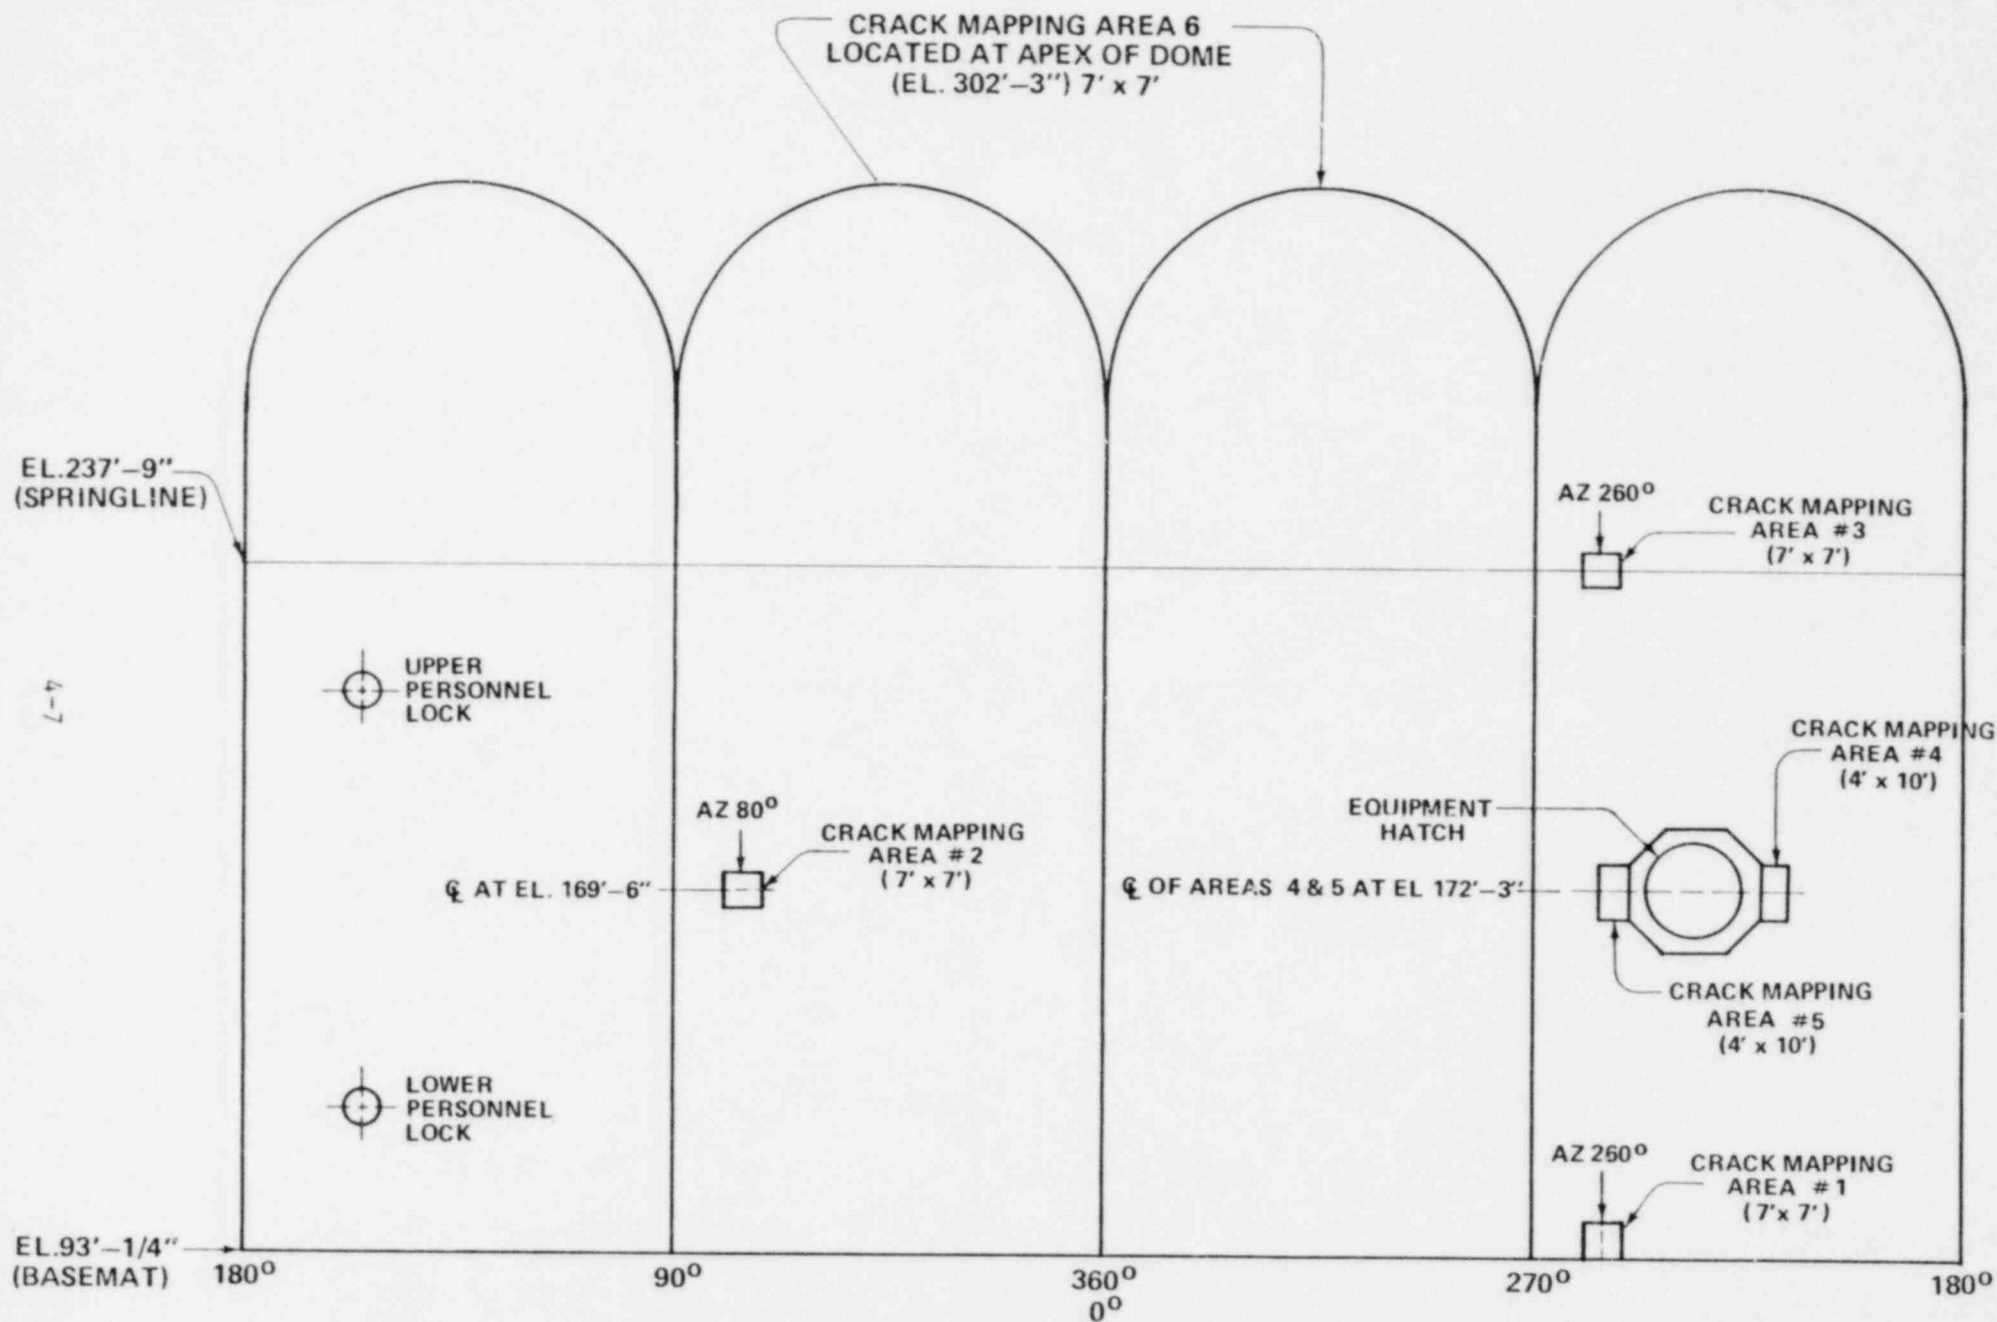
CONCRETE CRACK MAPPING AREAS
